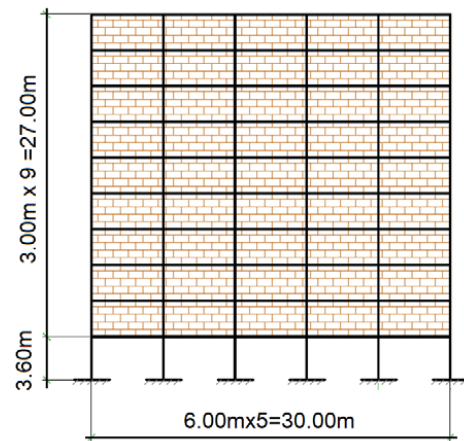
Scheme of the transverse frame of the reinforced concrete building structure
